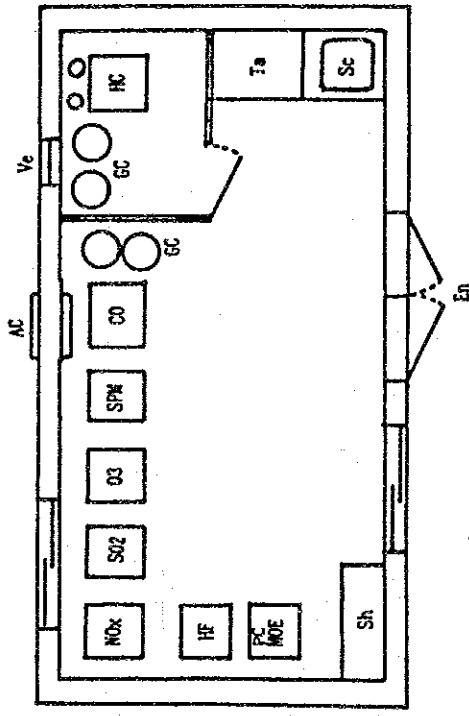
LAYOUT PLAN FOR INSPECTION STATION
